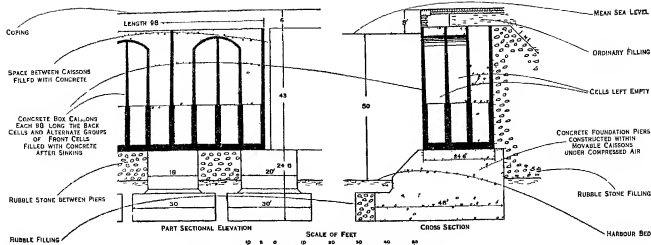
PRESIDENT WILSON BASIN MARSEILLES FR QUAY WALL OF CONCRETE CAISSONS ON DISCONTINUOUS CONCRETE FOUNDATIONS IN DEEP WATER
